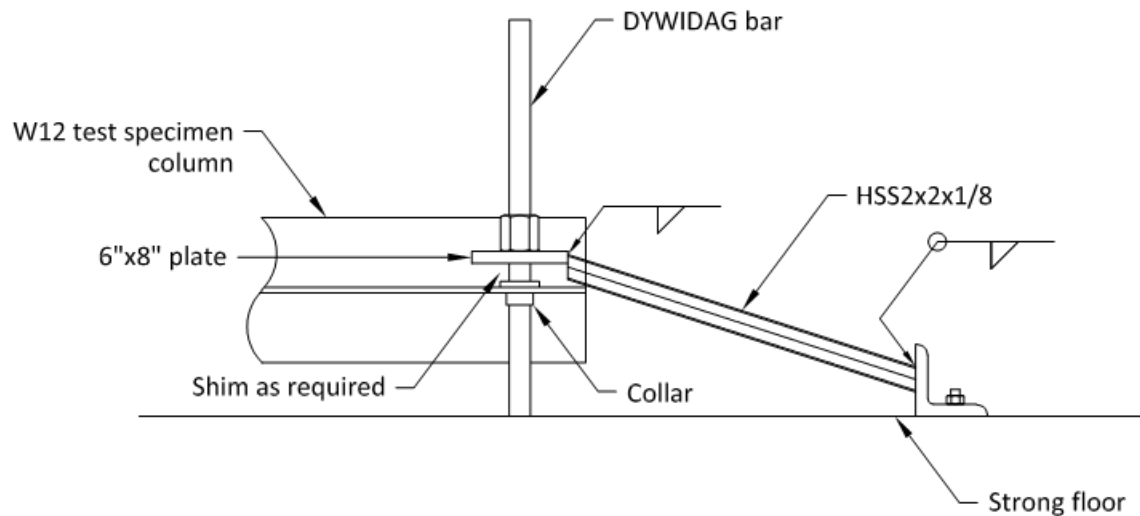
HSS Braces at End of Column Portion of Test Specimen
